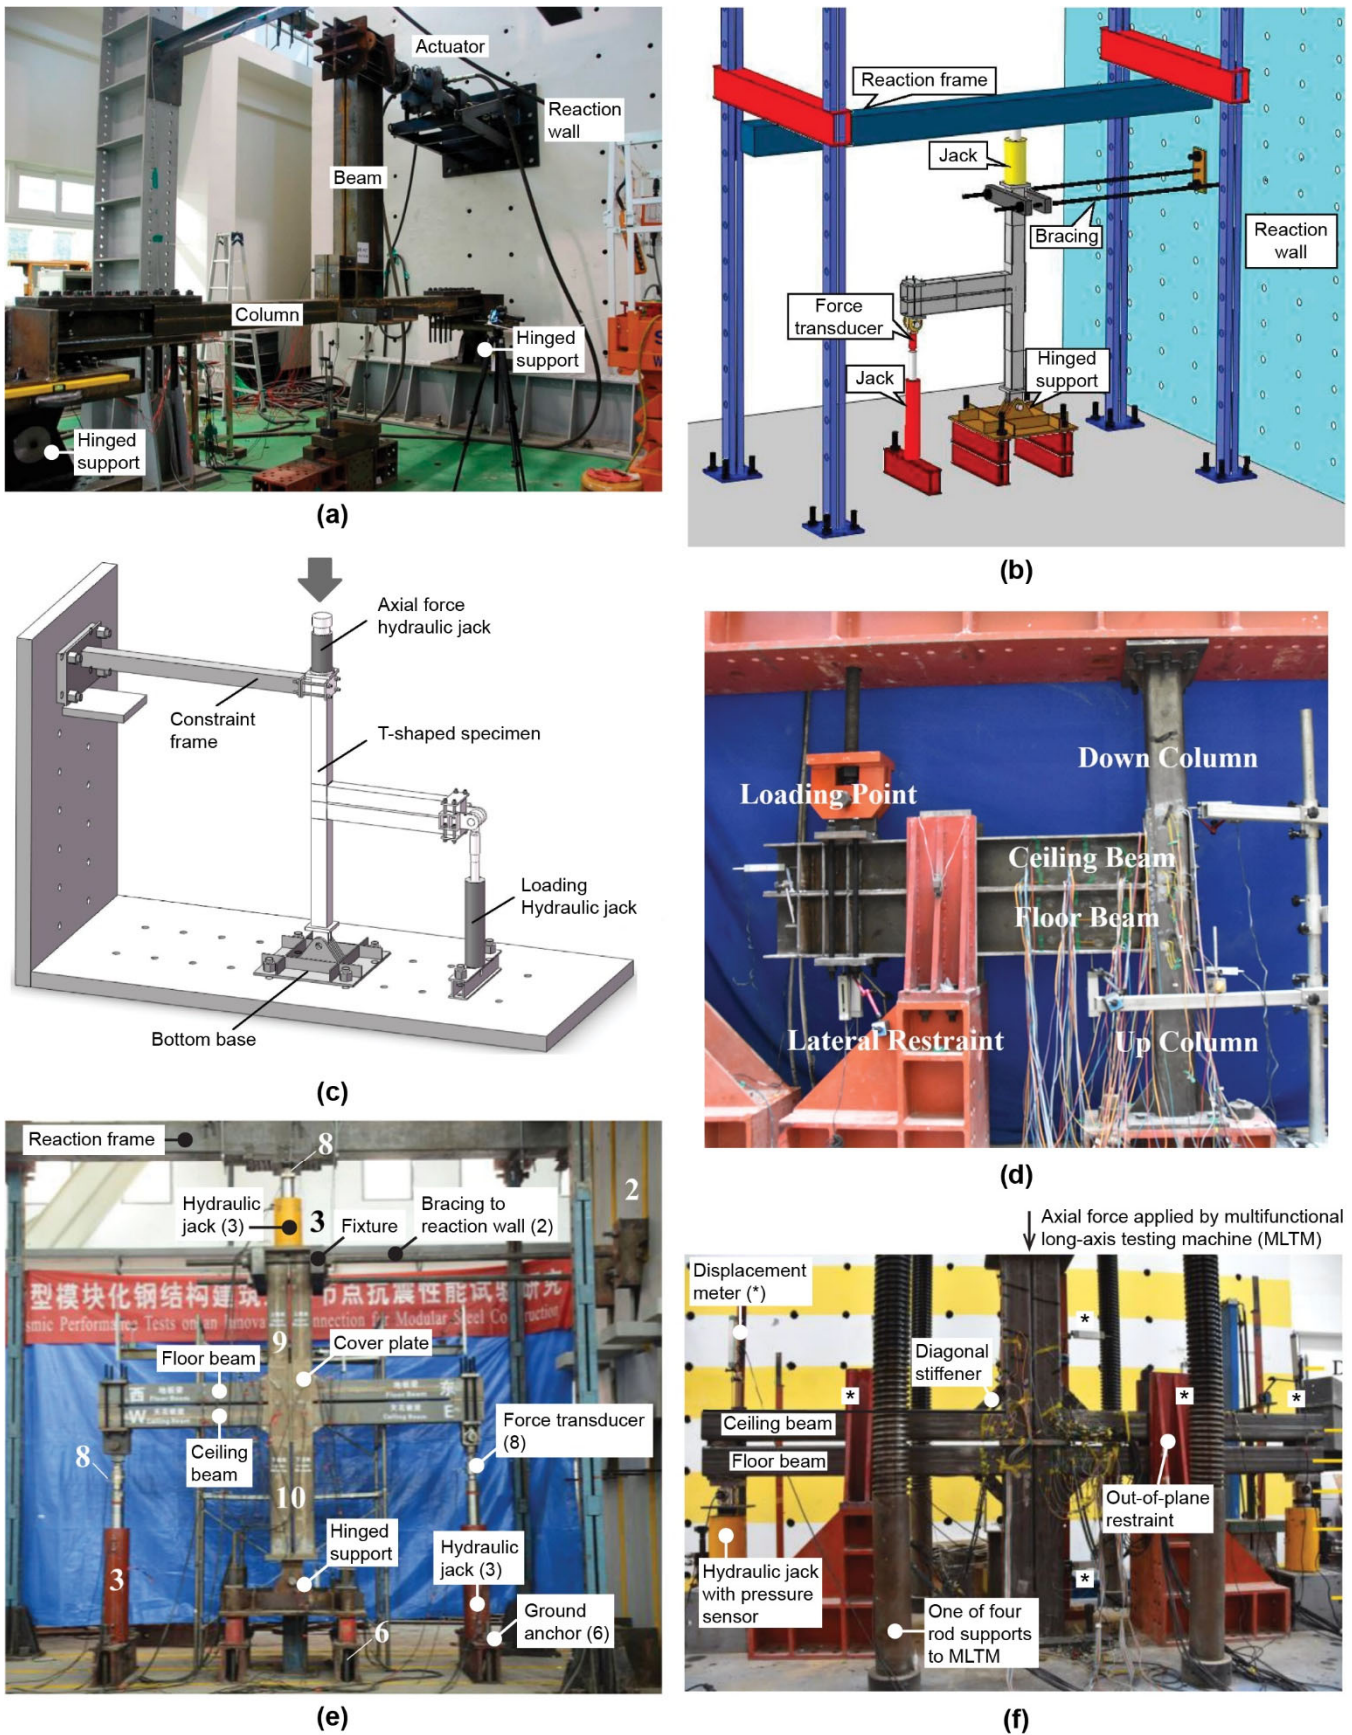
Beam-column subassemblage with beam loading for specimen with (a) ceiling bracket [23], (b) welded cover plate [25], (c) self-lock connection [27], (d) novel connection with superimposed beams [29], (e) cruciform bolted connection where 9 is the upper module and 10 is the lower module [26], and (f) connection with bolts installed in the columns [28]. Annotation revised and added for clarity.
